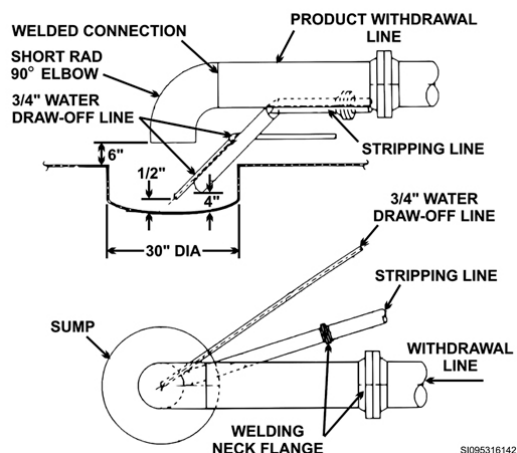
Piping inside a cone-roof tank with floating pan.
